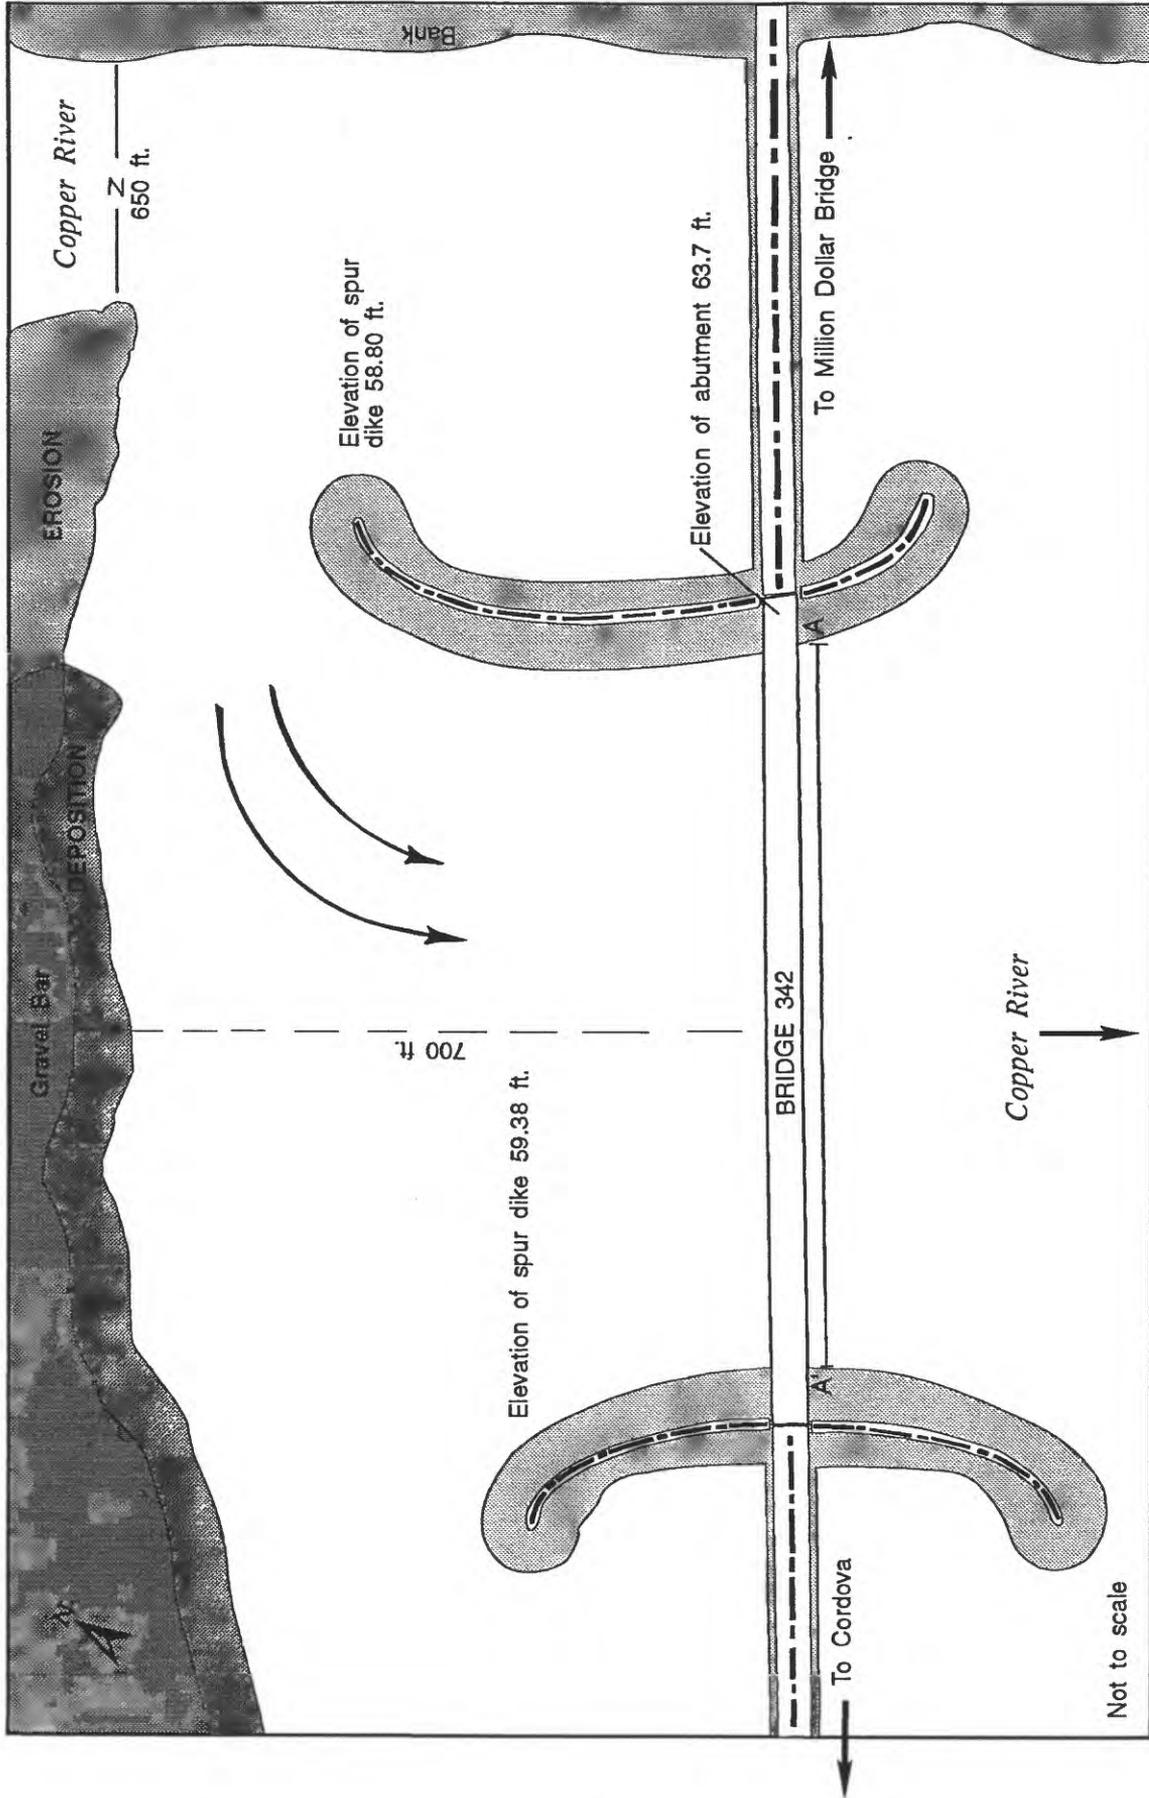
Bridge 342 area, showing erosion and deposition of gravel bar upstream from bridge between June 3 and September 16, 1992.
